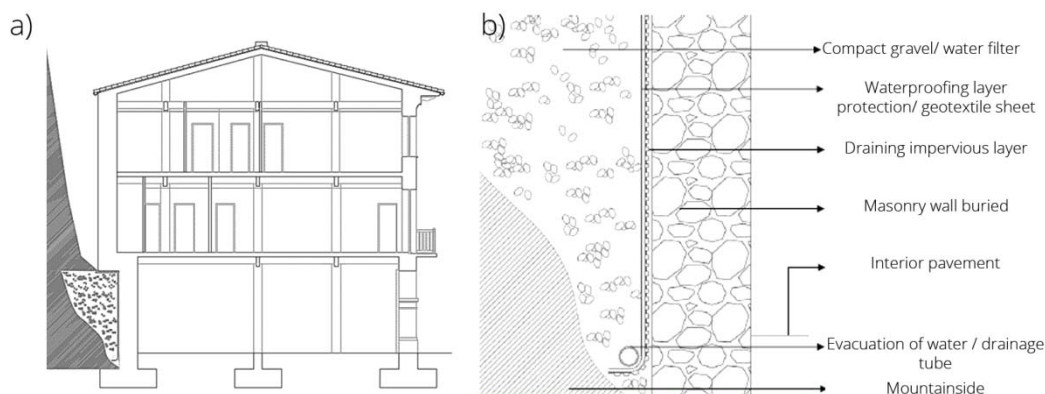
Intervention proposal. a) Section of the building and drainage system. b) Drainage system proposal to the buried wall.
